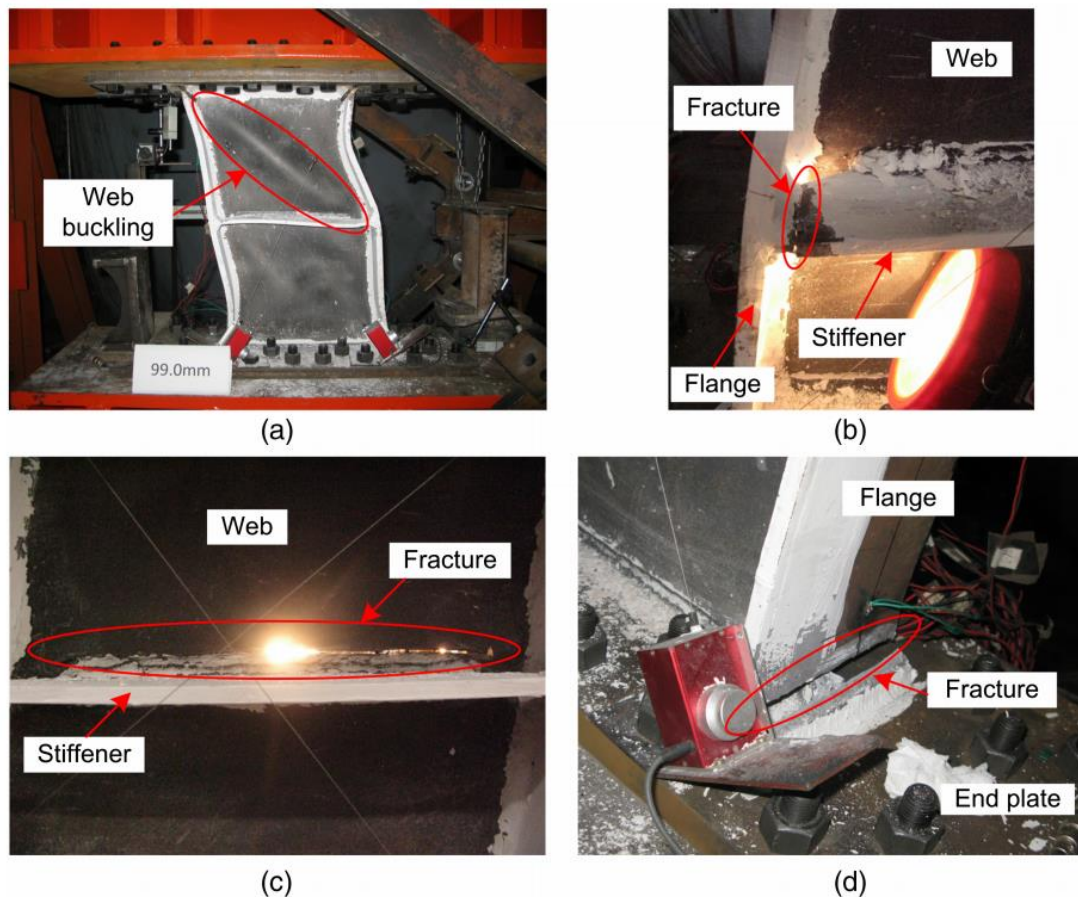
Damage of specimens: (a) web buckling (Specimen L13); (b) stiffener-to-flange weld fracture (Specimen L22); (c) web fracture (Specimen L12); (d) flange-to-end plate weld fracture (Specimen Q12) (Ji et al. 2016)
